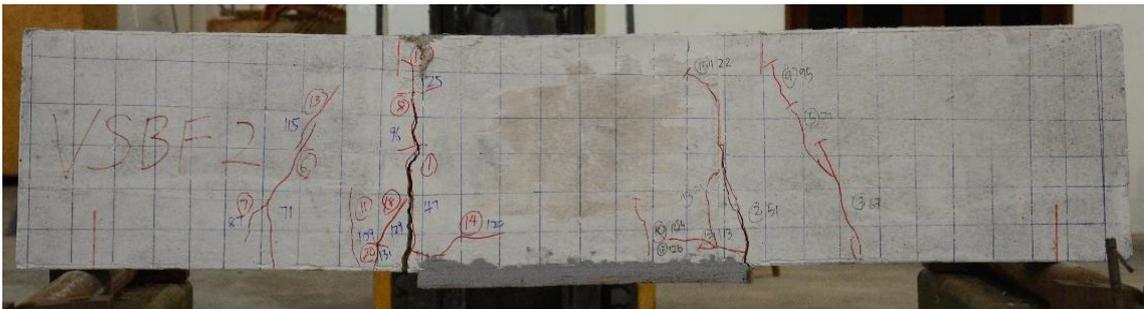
Crack pattern after failure for strengthened solid beam (VSSB)
